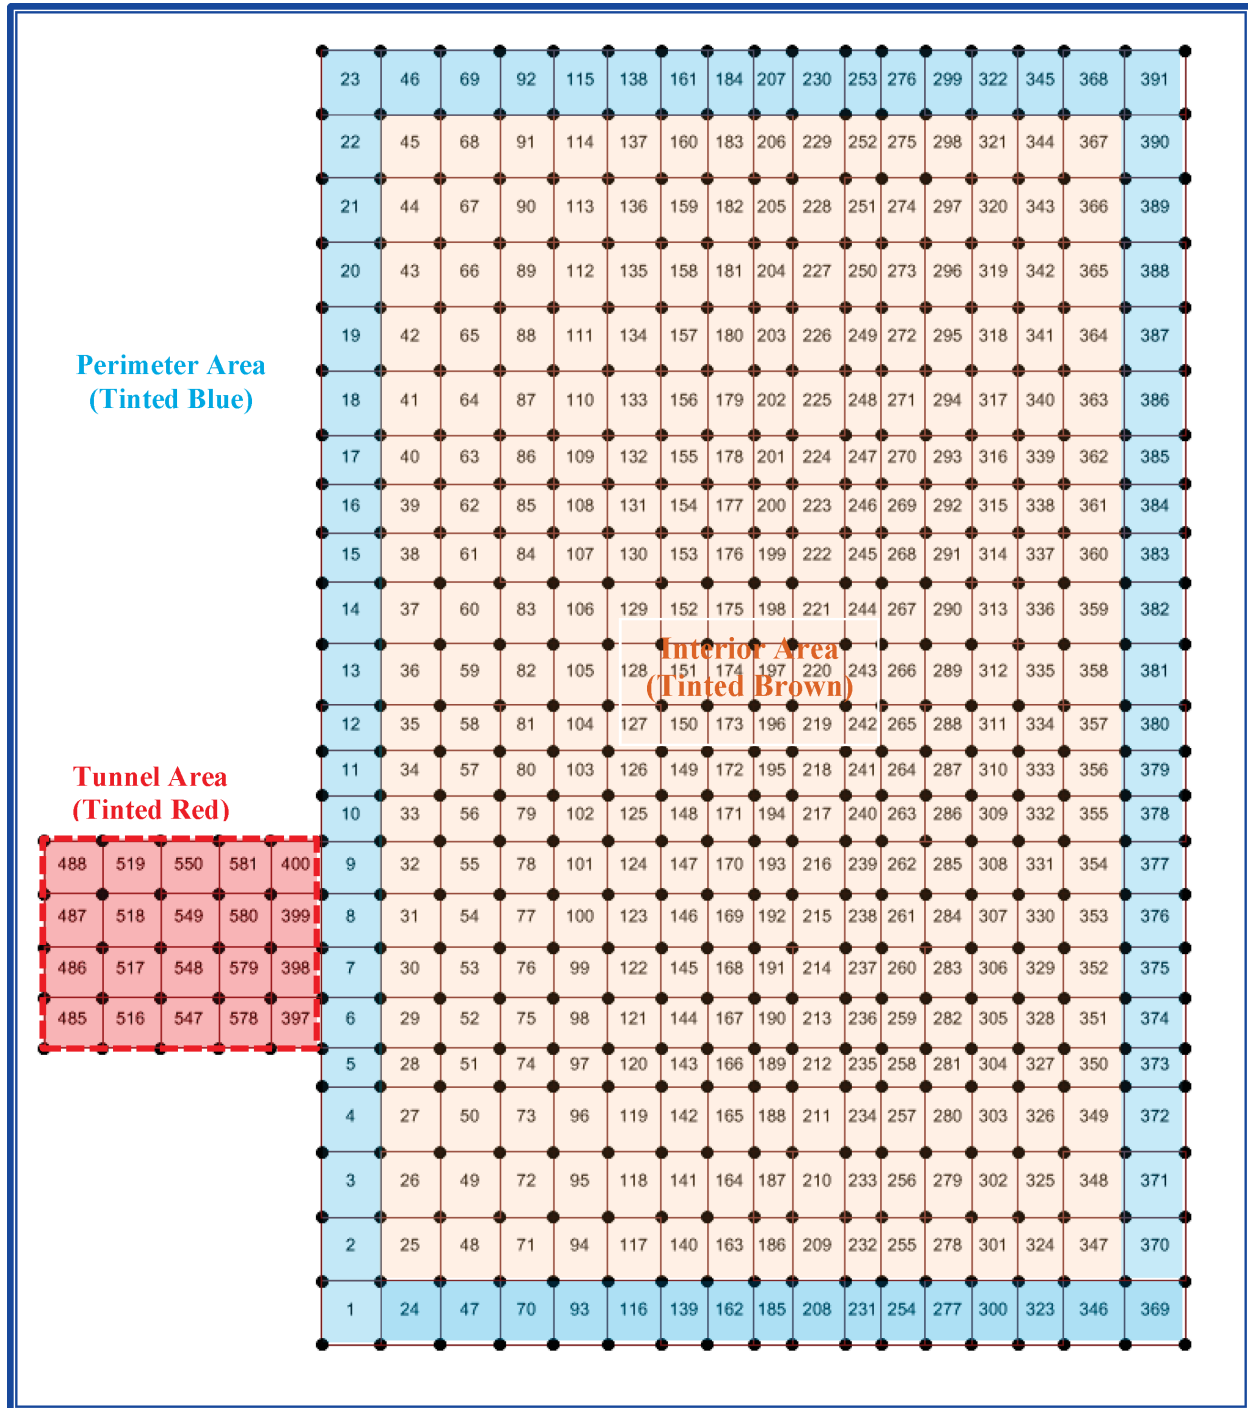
B-75: CRB Reinforcement Plan of Basemat Foundation
